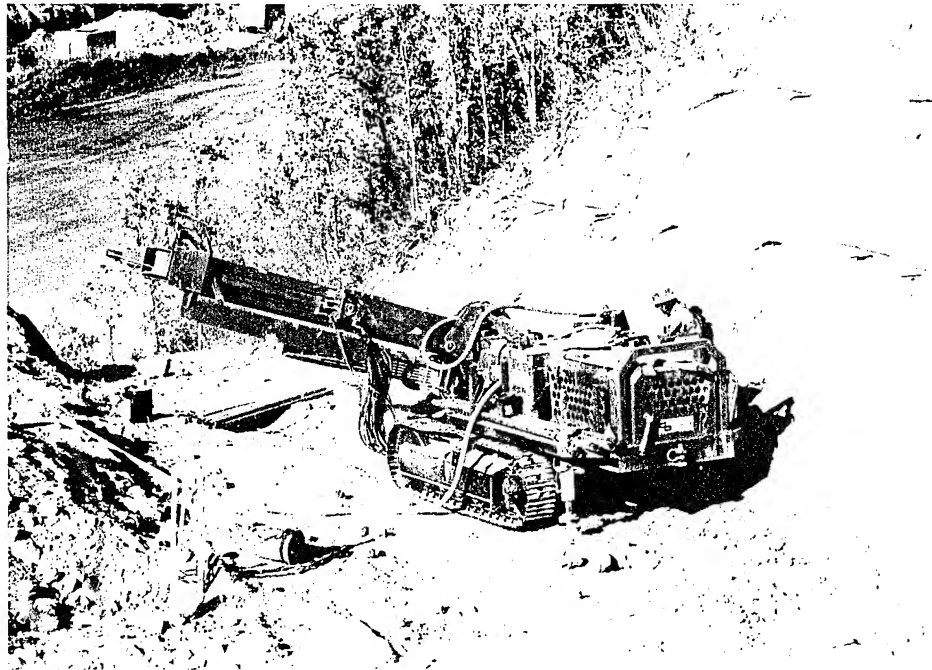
Craelius rotary drill - drilling anchor holes at downstream portal.
